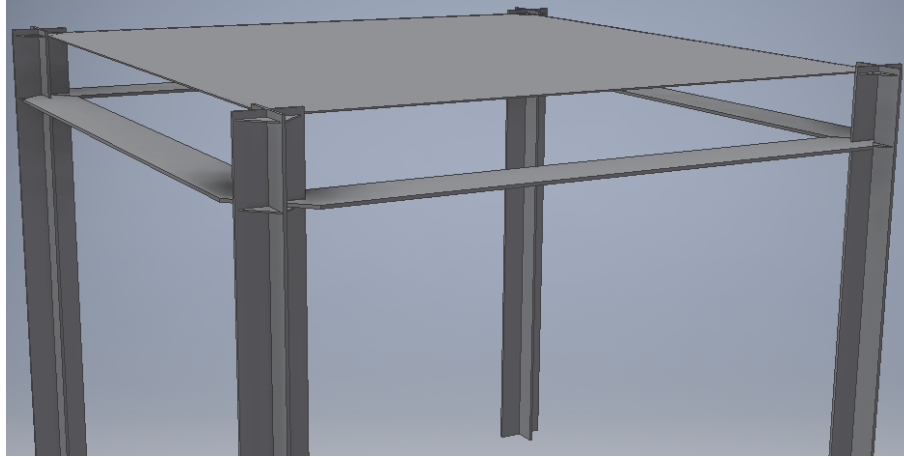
The CAD geometry of the assembled enclosure.
